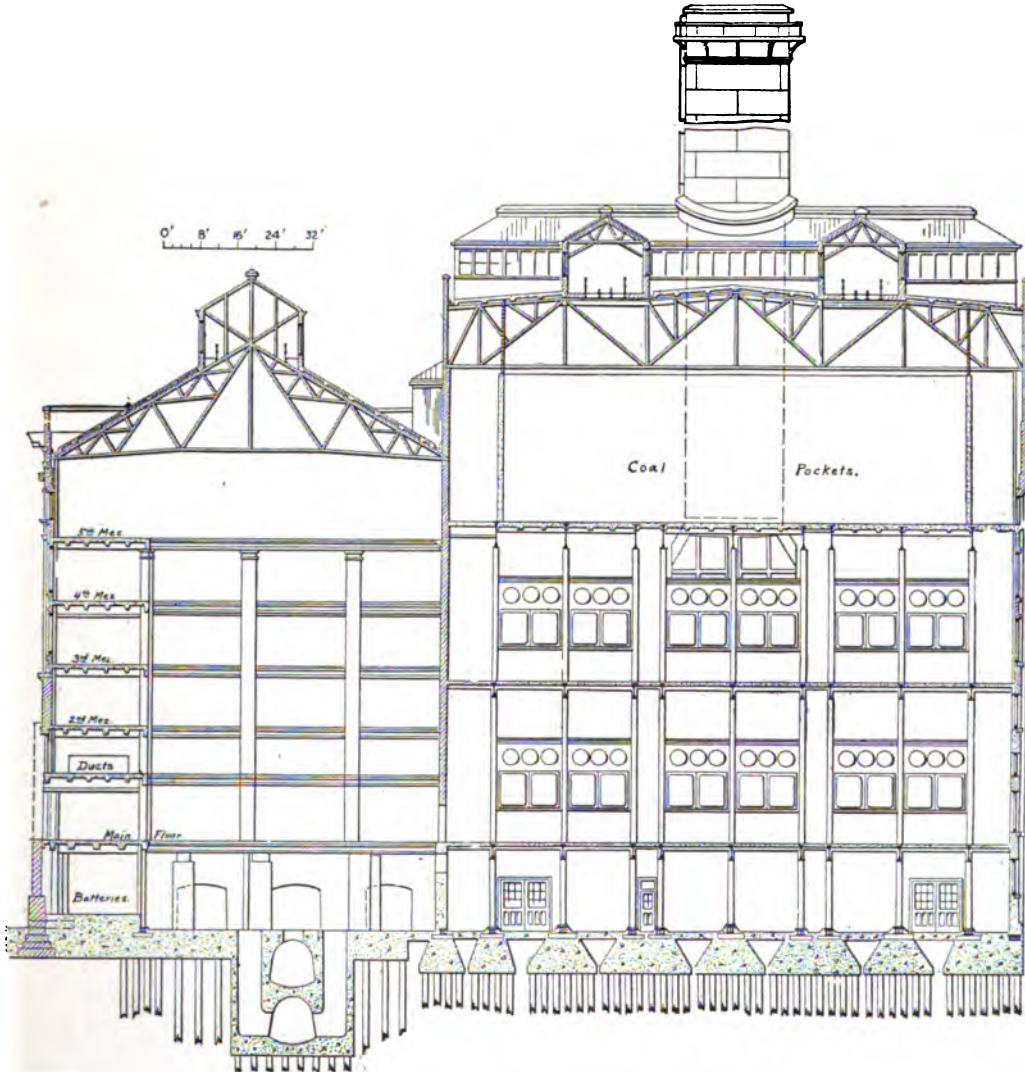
Structure of the Williamsburg Plant, Brooklyn (*Street Railway Journal*).
